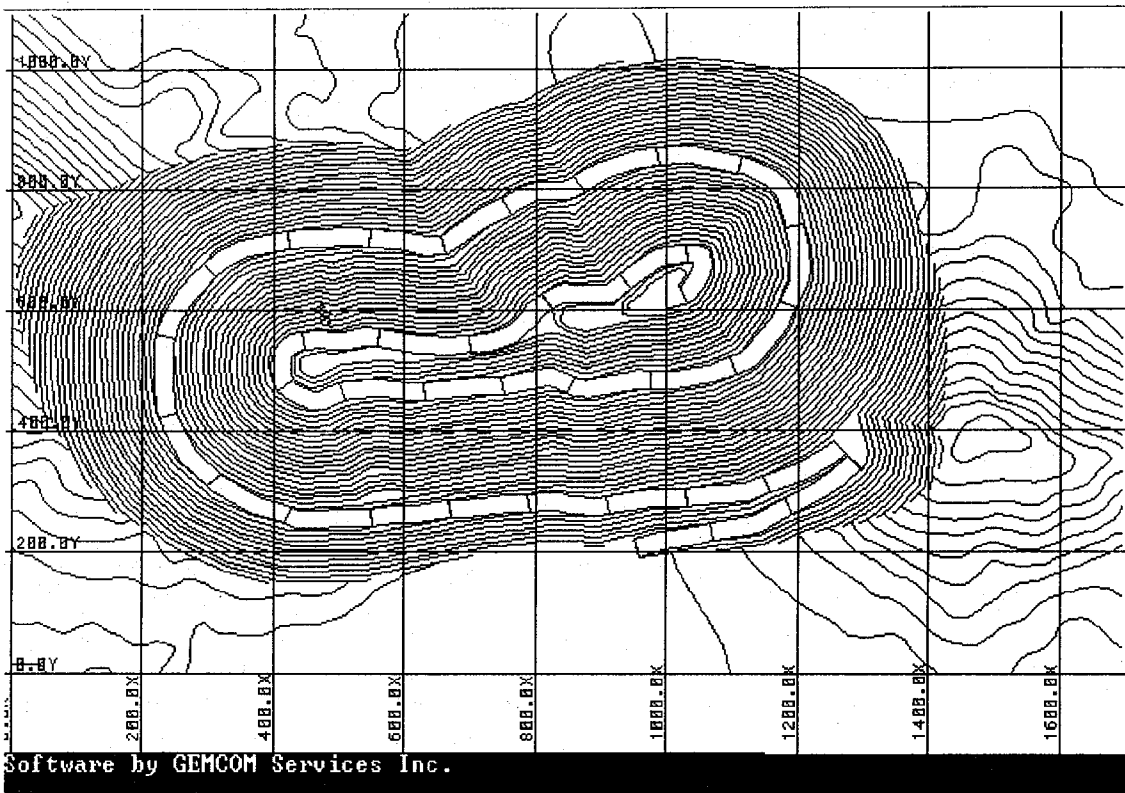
Pit # 17 - Whittle pit 4, with detailed ramp (try 1).
